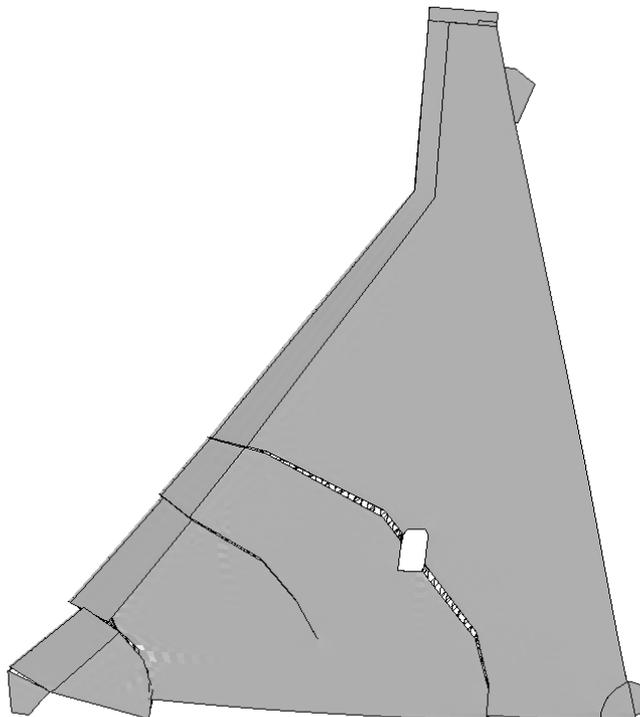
Example of a 3D model of a buttress dam with pre-defined existing cracks. (The lines crossing the cracks are truss elements representing reinforcement bars). From Malm et al. (2016a).
